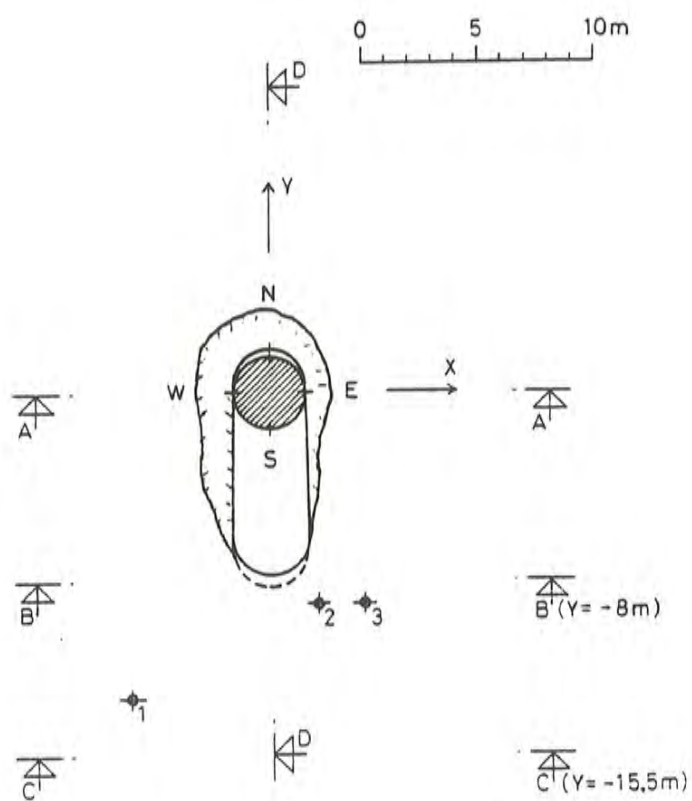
Site plan of the drilled profiles close to the lightpier Björnklacken, April 10, 1985
